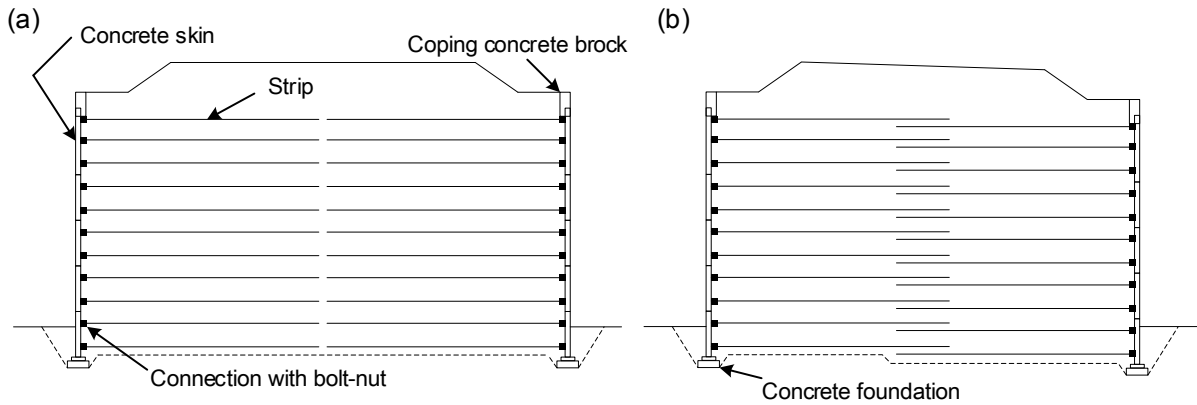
Embankment with reinforcing earth wall on both sides of embankment (Public Works Research Center, 2014): (a) connected type and (b) fitting type of wall.
